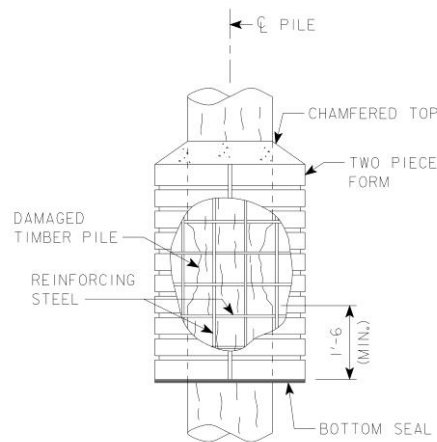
Strengthening Timber Pile with Concrete Jacket
